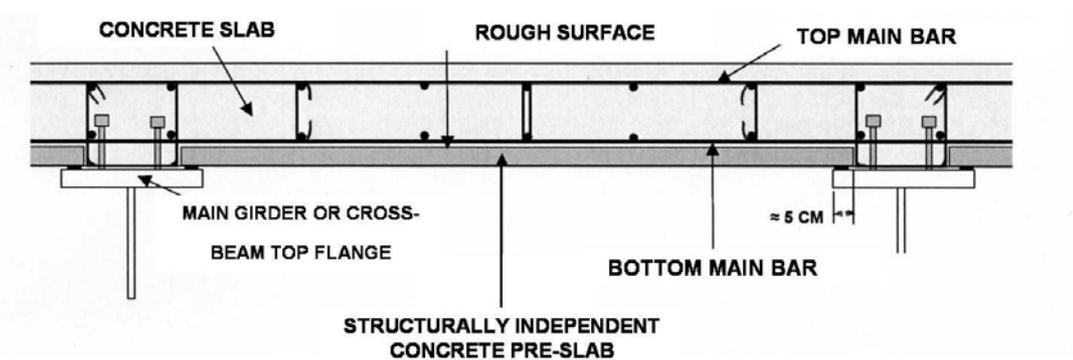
Slab formed by structurally independent pre-slabs (pre-slab reinforcement not shown)
